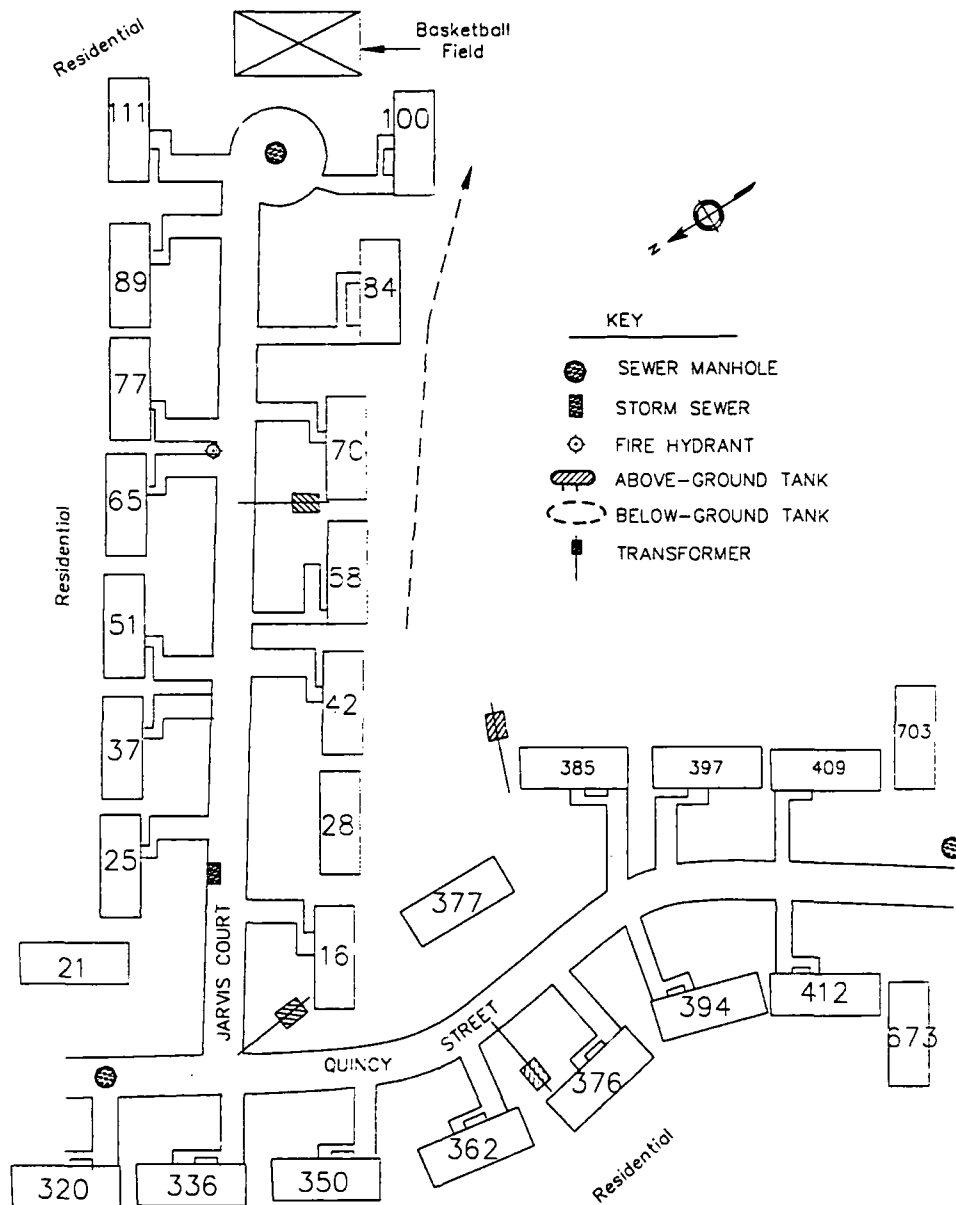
Site Plan Map of Fairfield Army Housing Units
